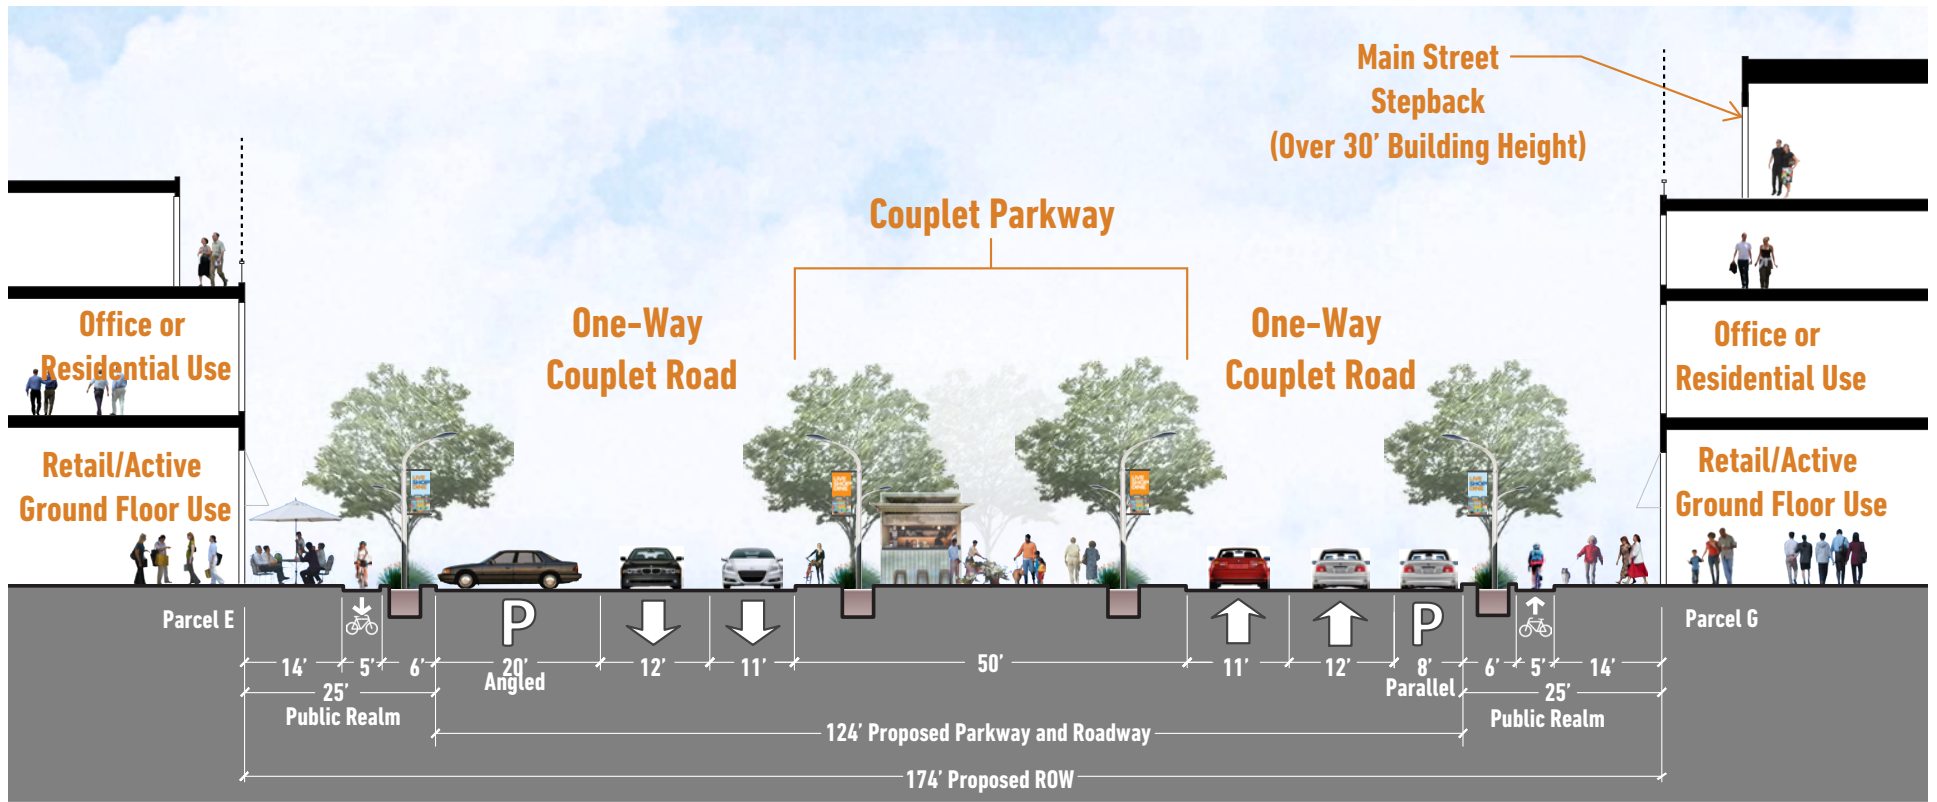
Couplet Parkway and 3rd Street Couplet Cross Section
